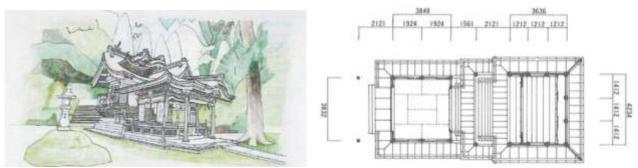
Whole View + Floor Plan Sketch: Source: Keimi Harada
